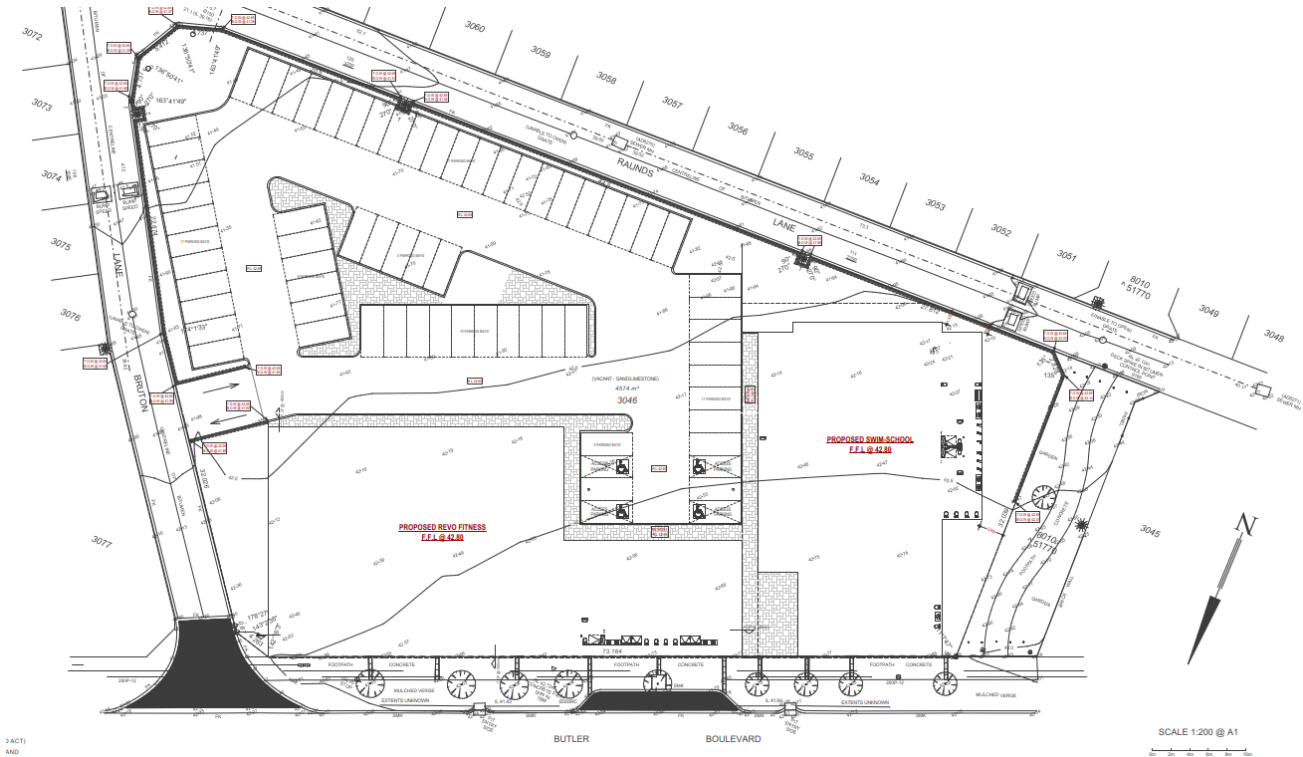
Development Site Layout (Laxxon Construction Design)
